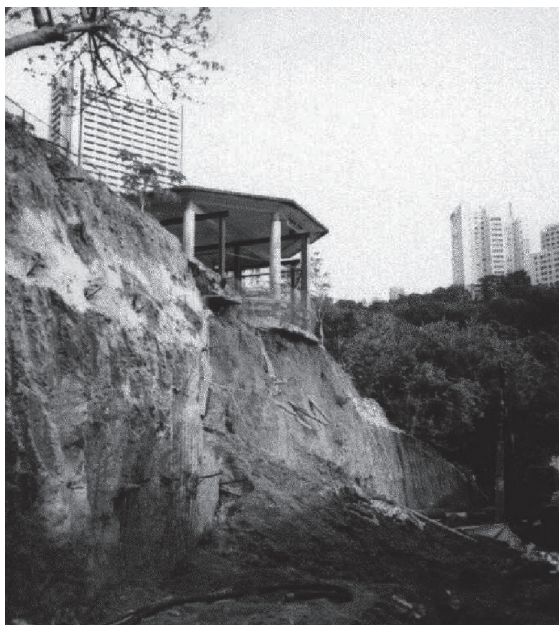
Major failure at a temporary soil-nailed slope without nail head
